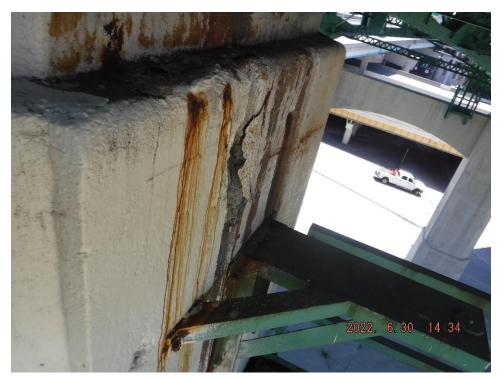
Spall with rust staining on the North Column of Pier 12
